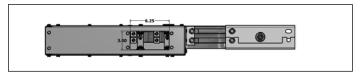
Left Hand—Tap Box Mechanical Lug Access
